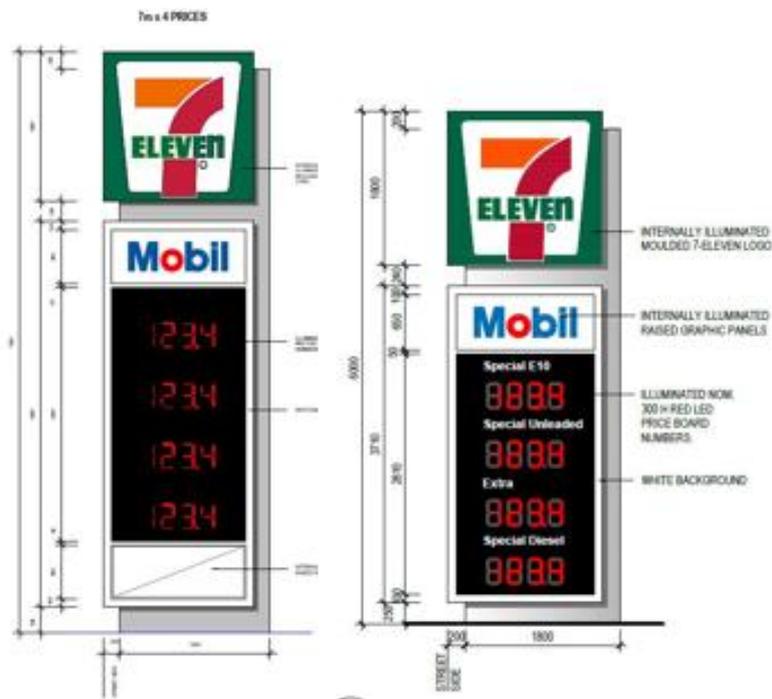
Original Pylon Sign (left) and Revised Pylon Sign (right) (Facing Tomsitt Drive)
